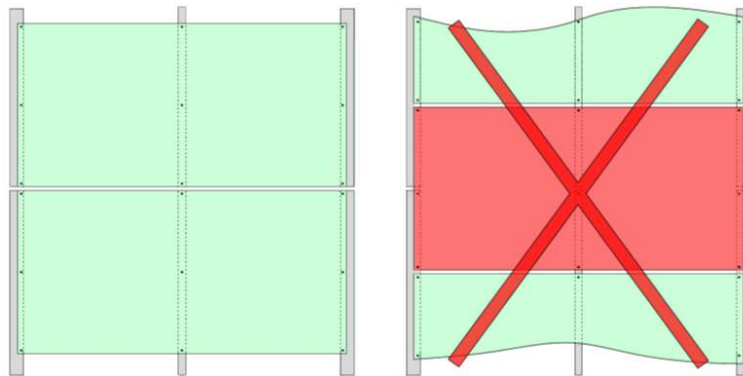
Left: example of a correct way to secure Silbonit panels, with the horizontal joint of the cladding aligning with the expansion joint of the subframe profiles. Right: example of an incorrect way to secure the Silbonit panels, with a cladding sheet secured to two profiles.
